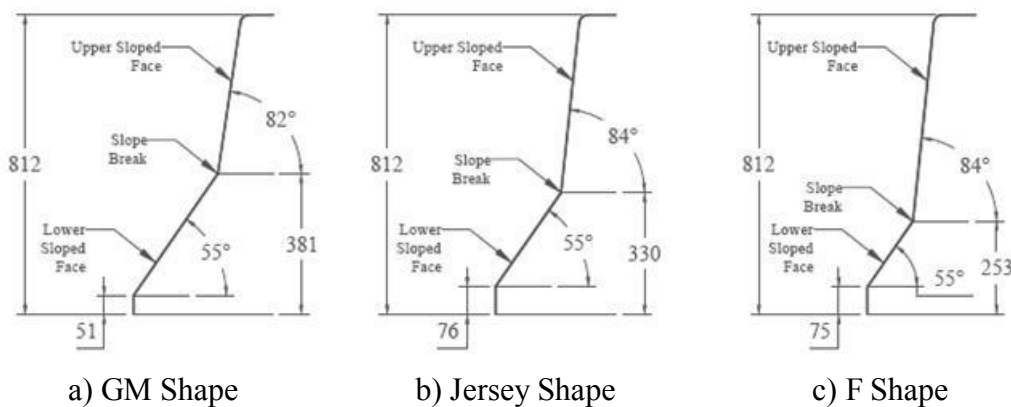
Concrete Barrier Safety Shapes (McDevitt 2000)
